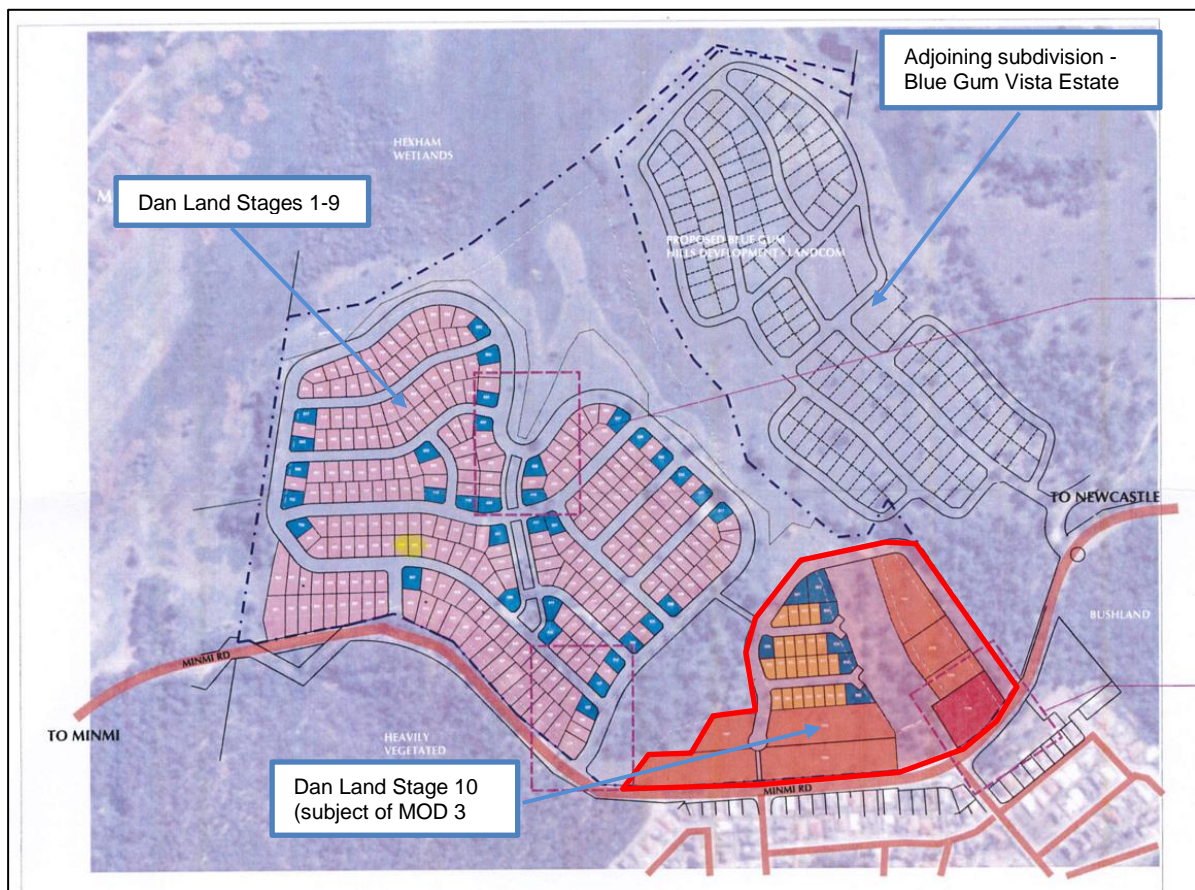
Approved subdivision layout (note: Stage 10 subject of this current modification application in RED) (Source: Proponent)
